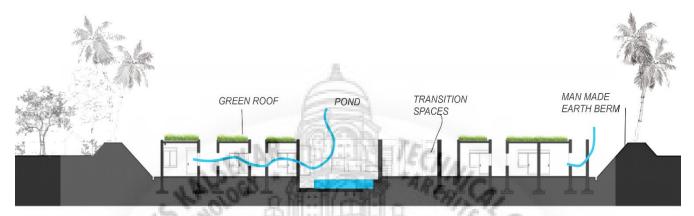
section of friendship centre through pond showing different space around pond courtyard
